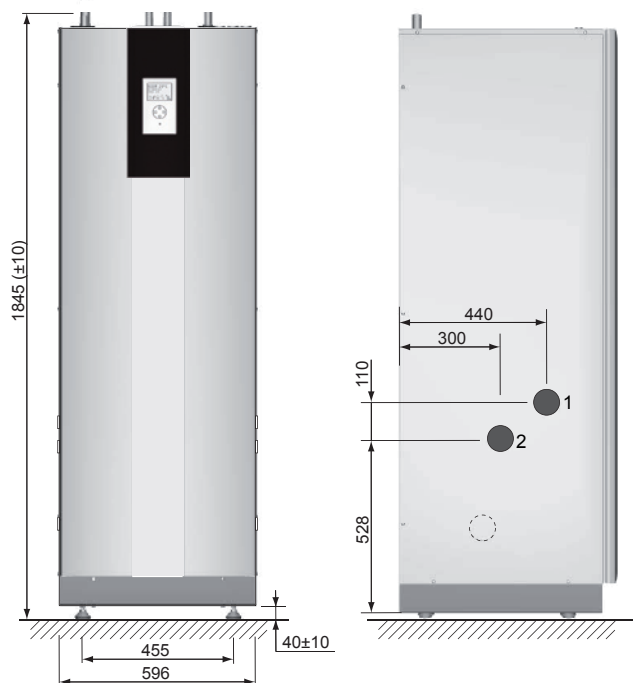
Geysir, Geysir with Passive cooling Dimensions and connections.
